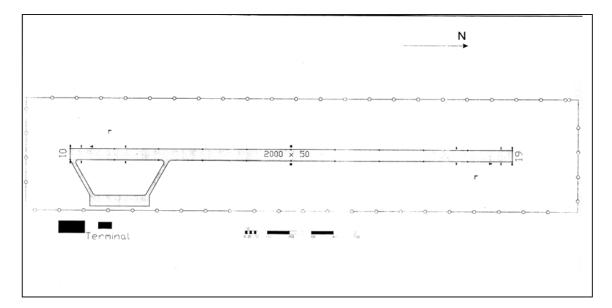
Baruunturuun-Sum Airport Layout Plan
